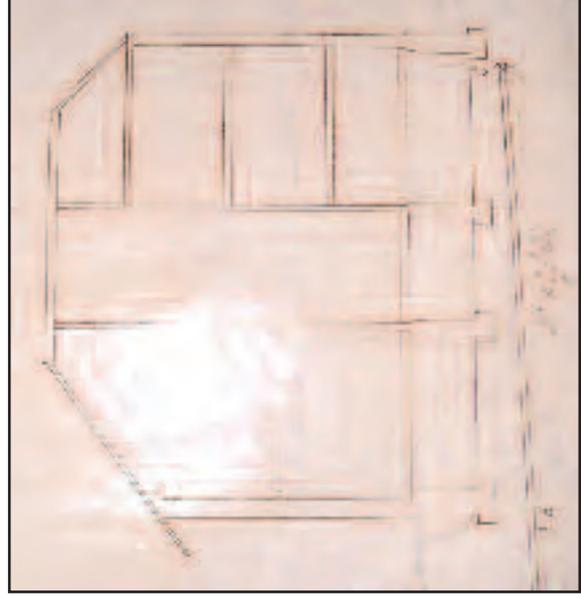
Section through house, 1-15 Tyndall Avenue, 1903
